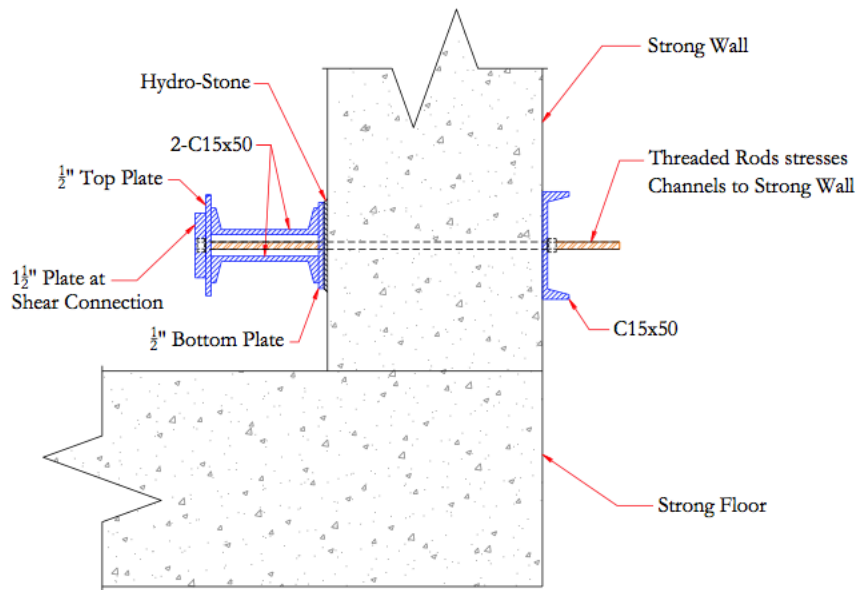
Cross Section of Channel Assembly and Strong Wall [Powell, 2010]
